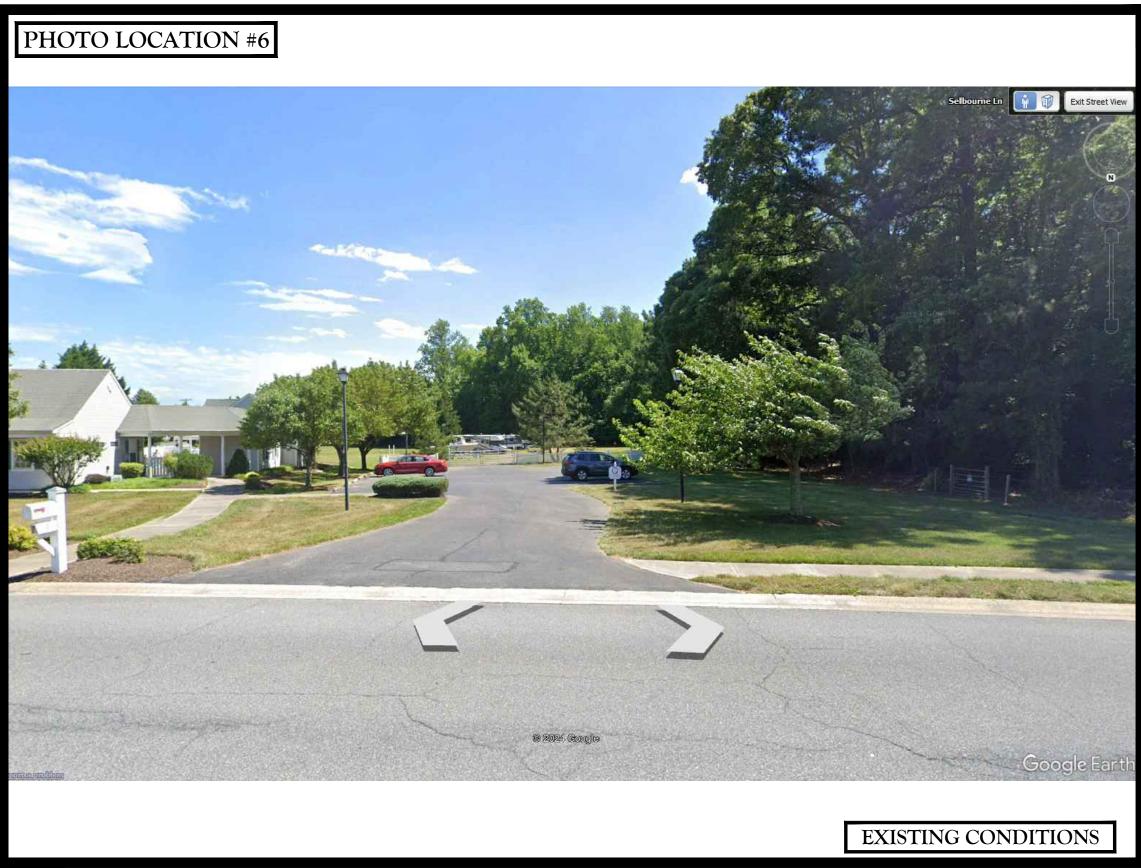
FROM SELBOURNE LANE LOOKING SOUTH TOWARDS THE SITE EXISTING CONDITIONS
